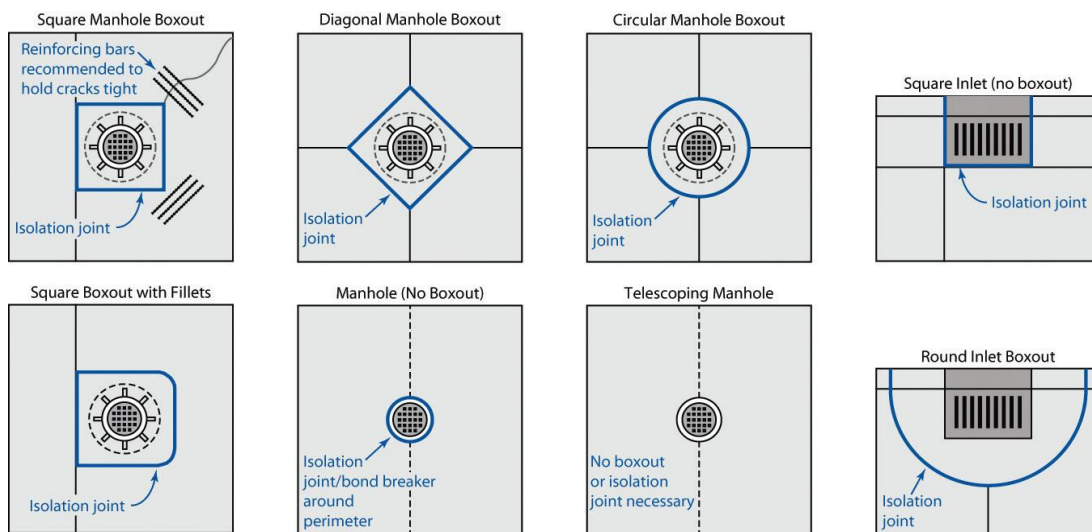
Examples of jointing adjustments to accommodate utility access points without inducing panel cracking
